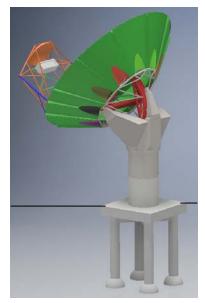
Foundation design used for costing. The slab below the antenna is at ground level, with concrete caissons extending below grade.
